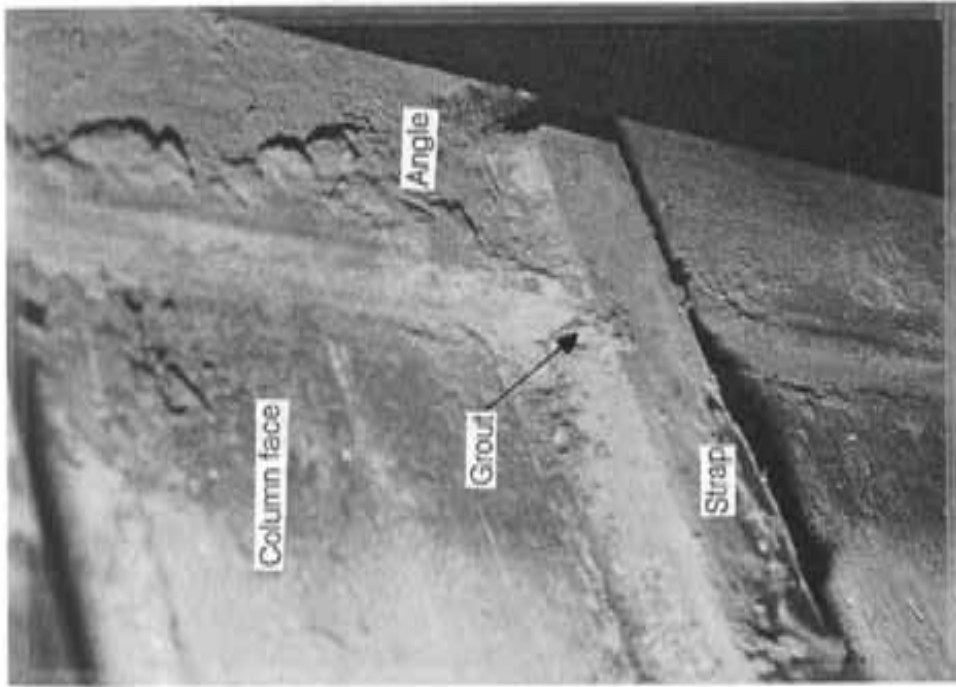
Cement grout between column face and steel elements (angles & straps)
